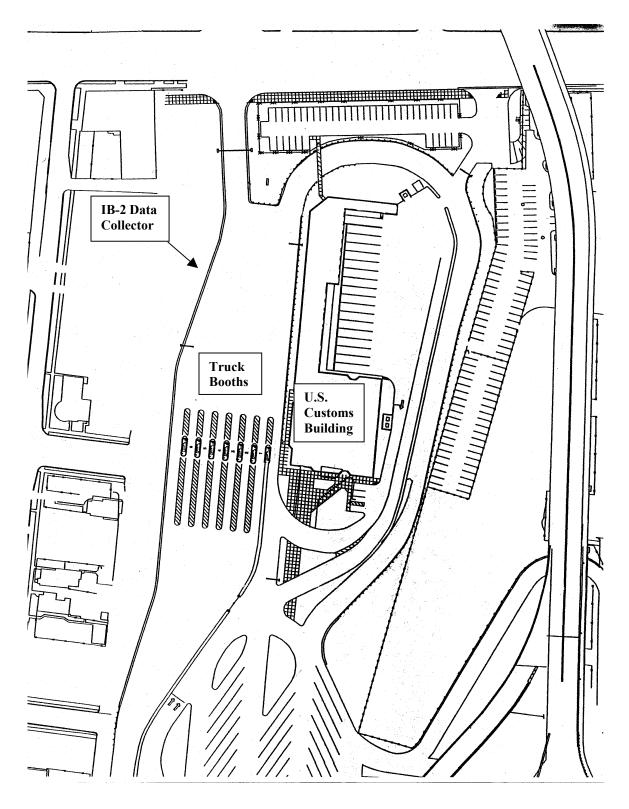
Layout at the Inbound 2 (IB-2) data collection site on the Detroit side.
